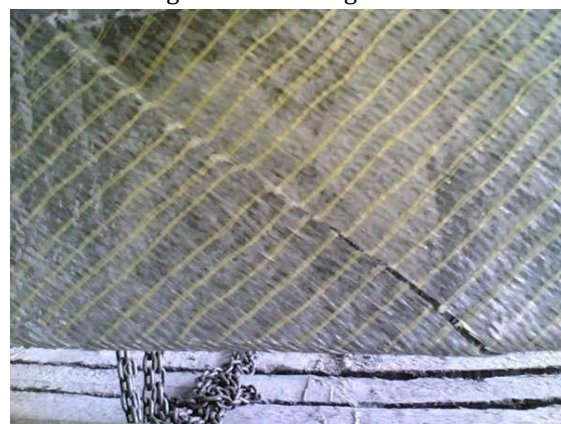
Failure of Beam Retrofitted with GFRP Jacket with fibers at 45 Degree to The Longitudinal Axis of Beam
